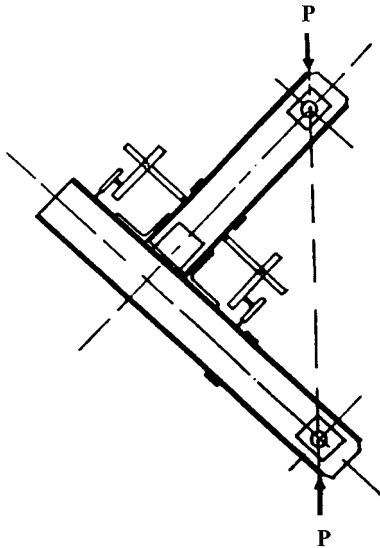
Exterior PFRP beam-to-column connection setup.
